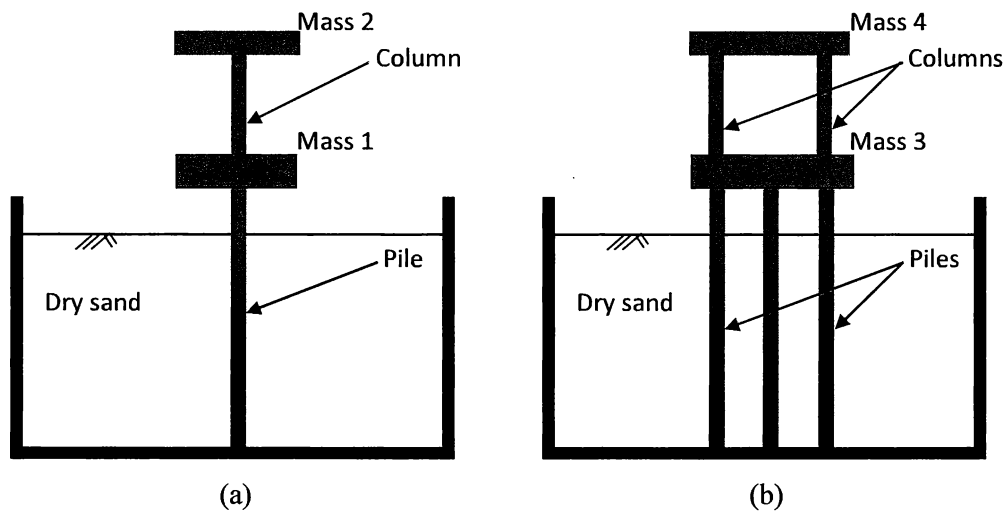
A schematic view of end bearing single and 3×3 group piles supporting DDOF structures: (a) single; and (b) group piles
